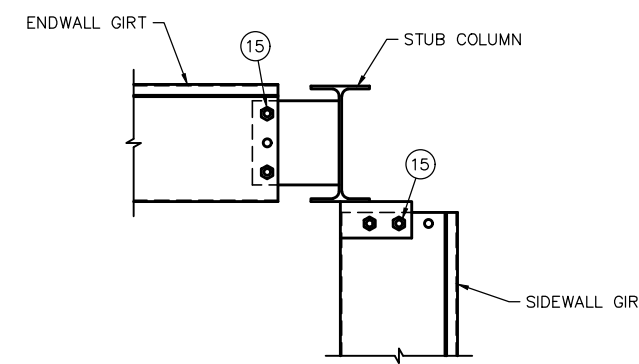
DETAIL: WIND BENT AT RIGID FRAME COLUMN W/ FLUSH GIRTS
